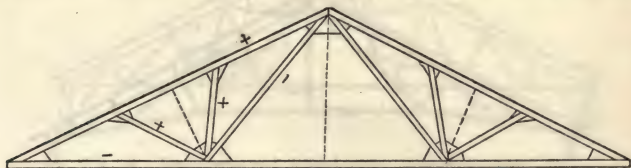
Fan Truss. Spans from Thirty-six to Fifty Feet
